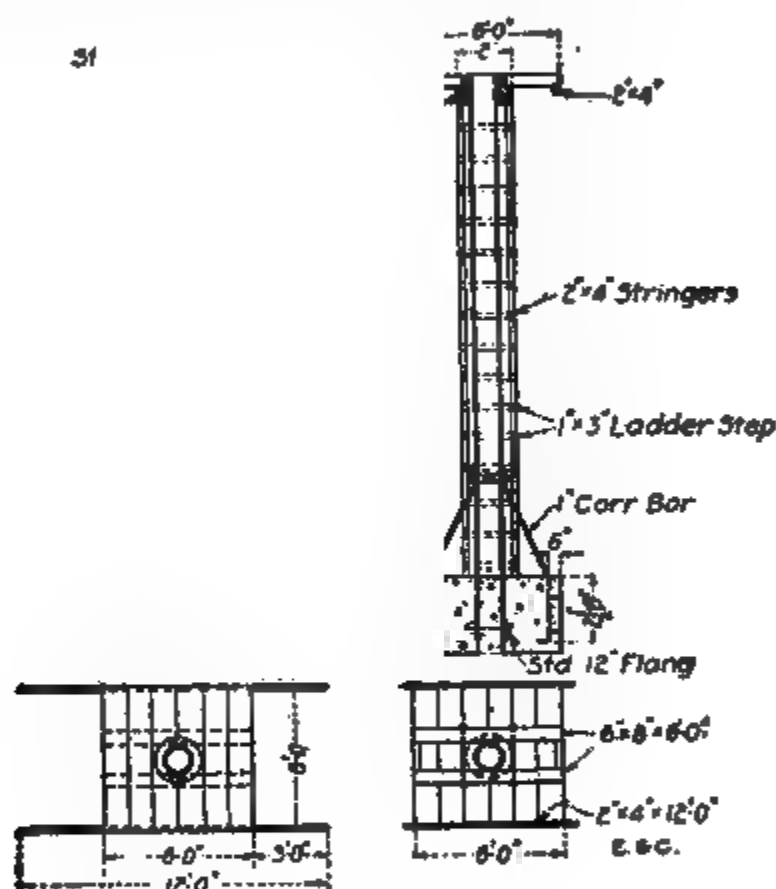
Details of Portable Platform for Drilling Holes for Anchor Bolts on River Bottom.
